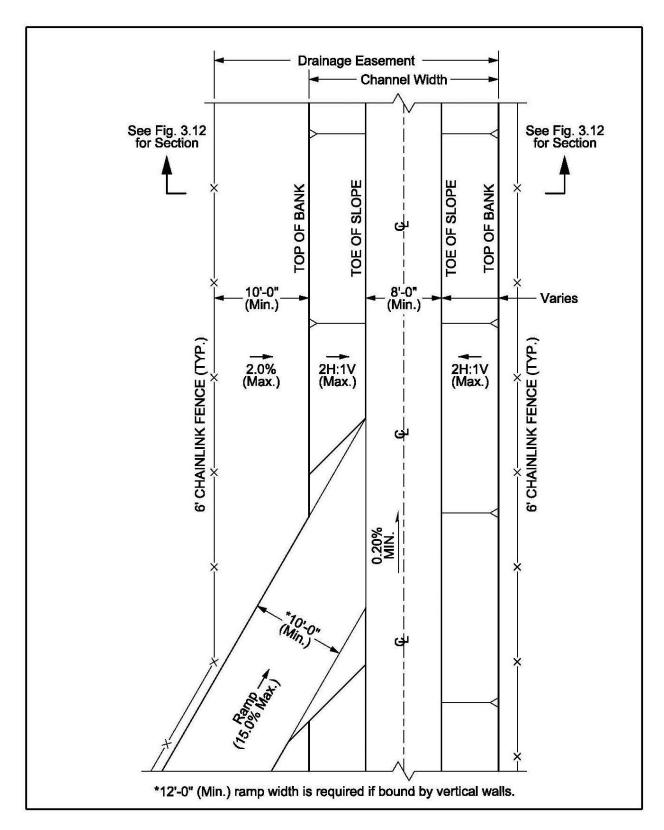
Typical Plan – Trapezoidal Concrete-Lined Channel
